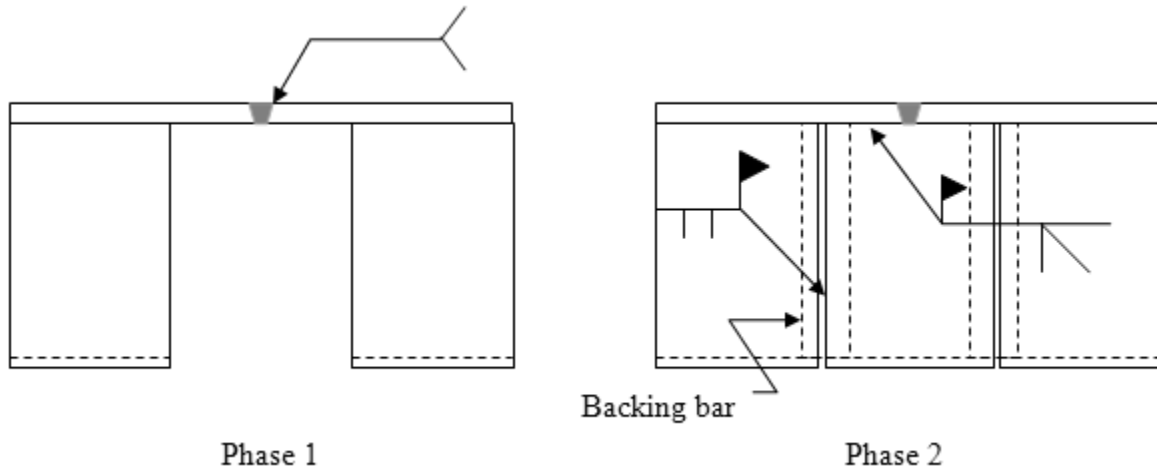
Transverse Floorbeam Web Bolted Splice and Longitudinal CJP Deck Splice
